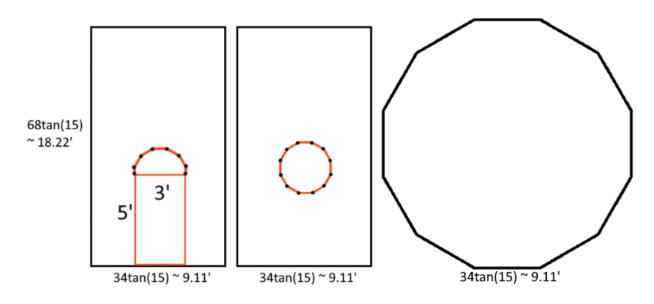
Dimensions of Door, Wall, Window, and Outer Wall base
